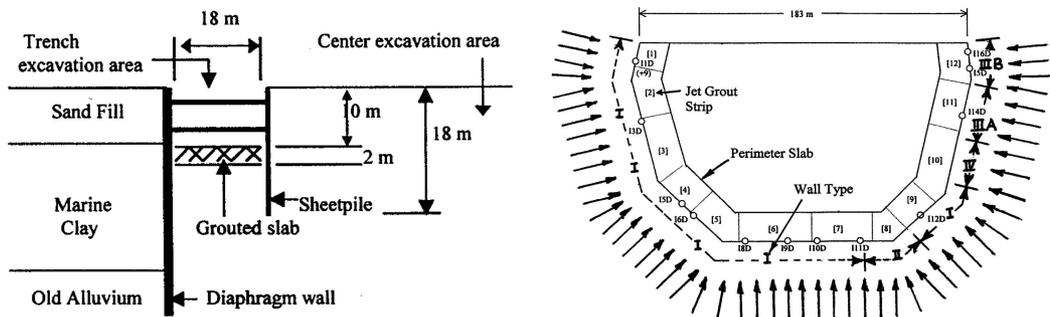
Perimeter concrete slab (16 m wide and 0.9 m thick) at formation level acting as a compression ring.
